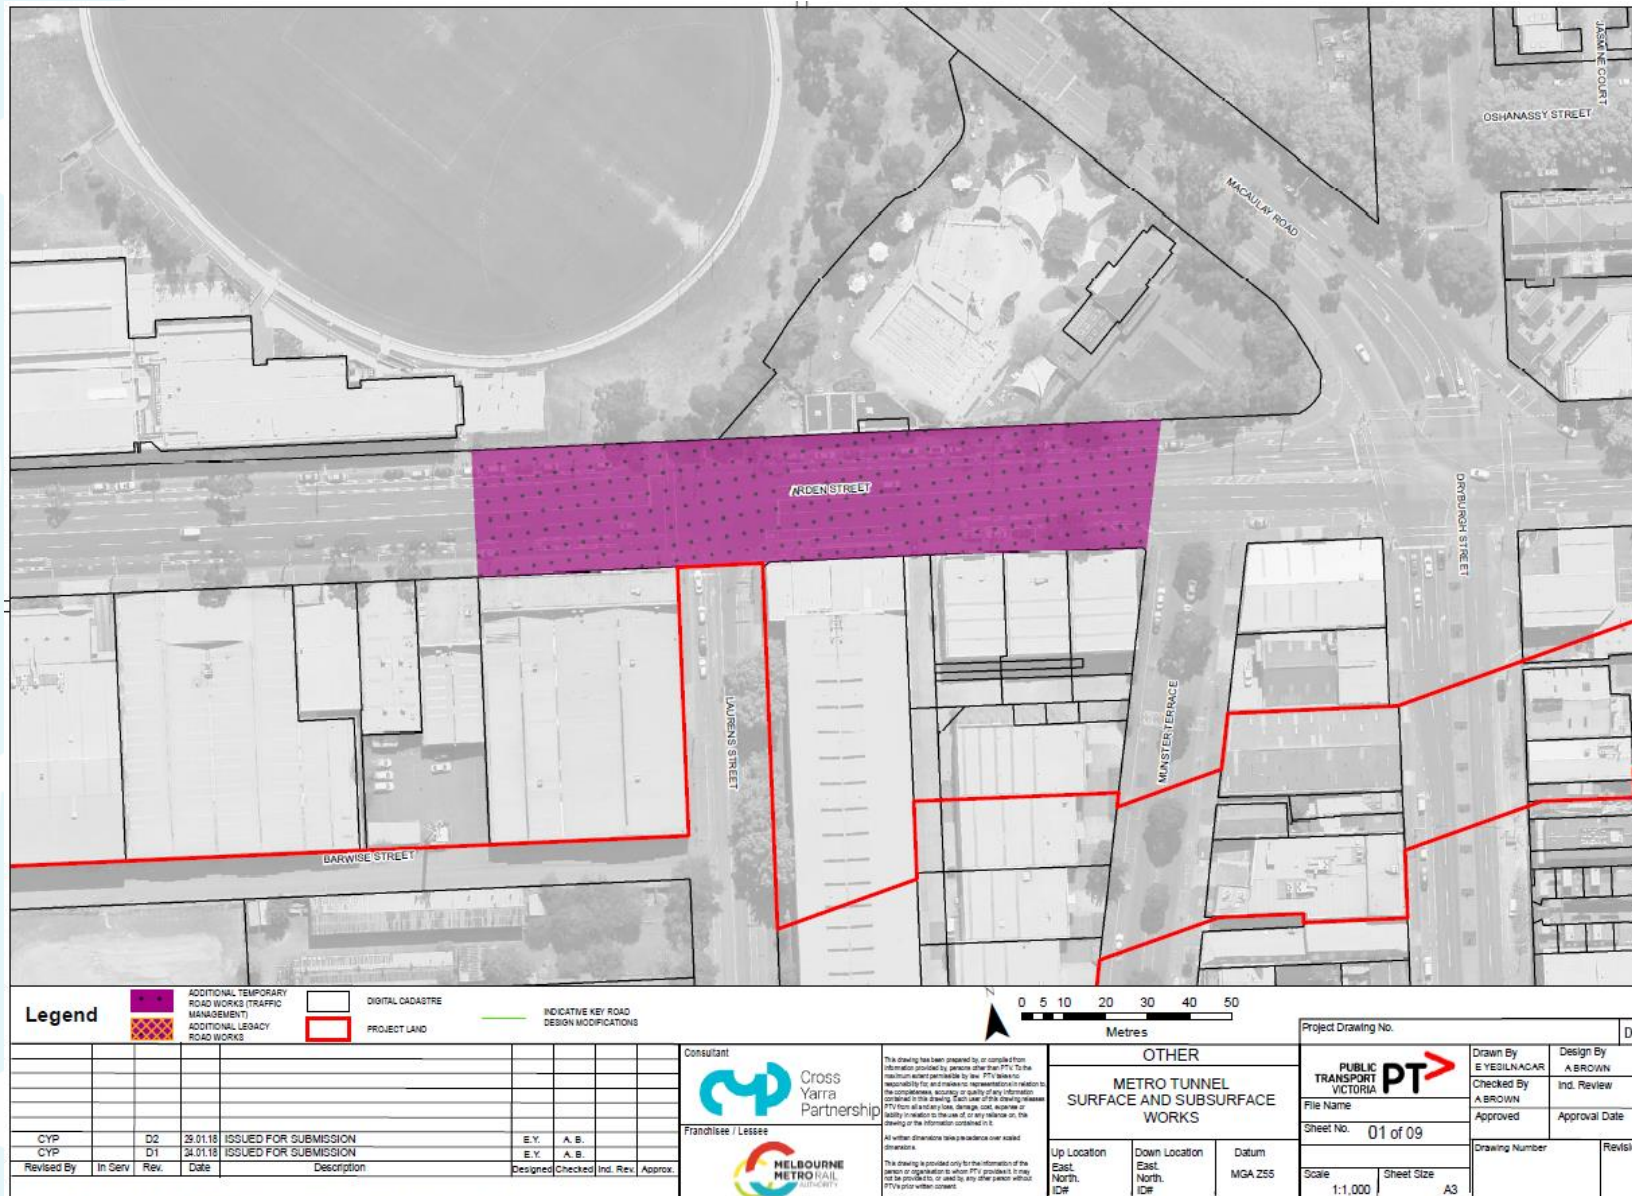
ARDEN STREET ADDITIONAL ROAD SURFACE WORKS
